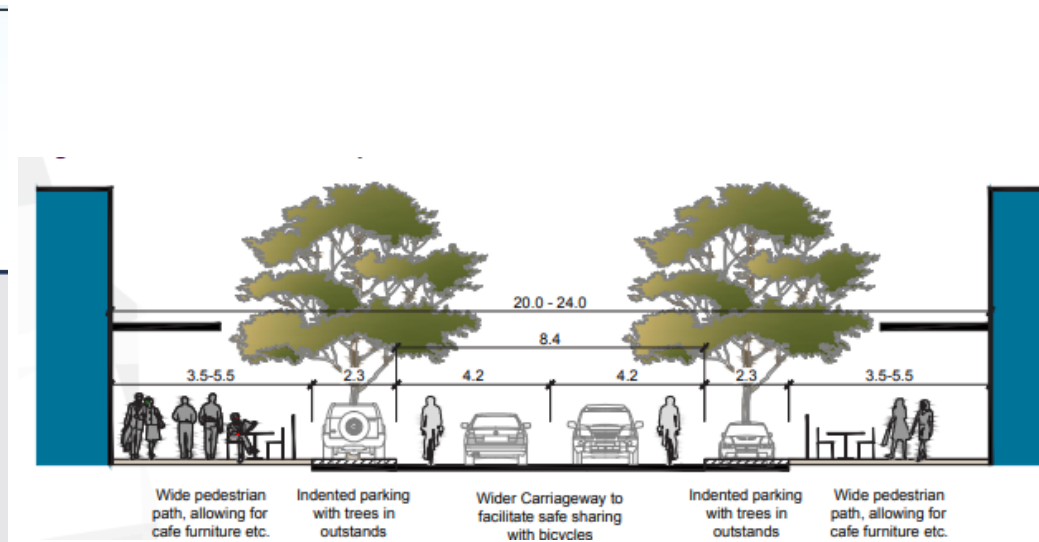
Cross section of the VPA Connector Street – Main Street for LTC (20-24m)
